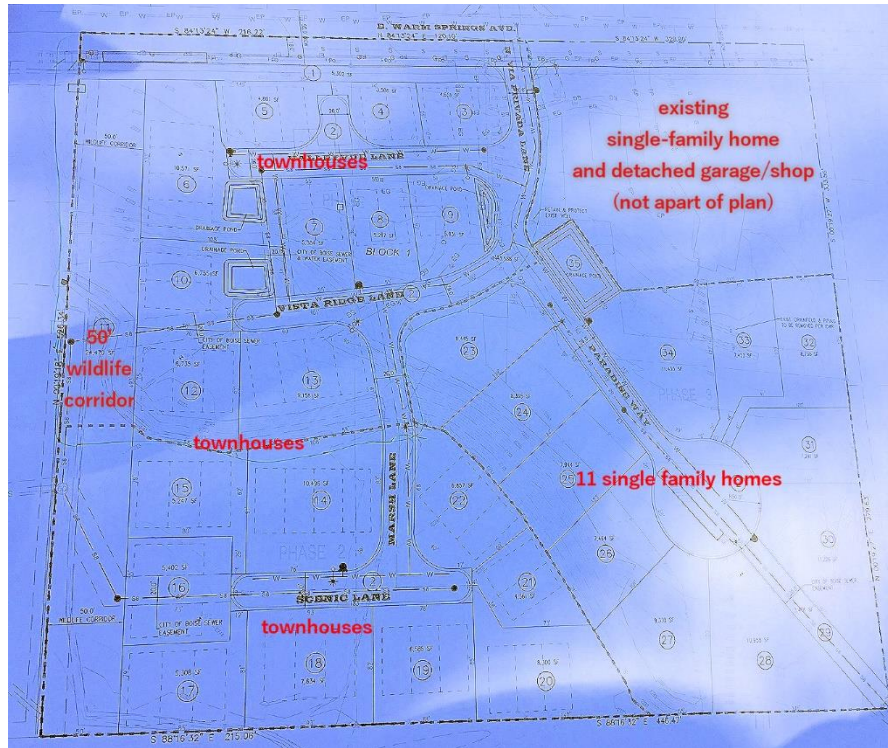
Vista Ridge site plan (single-family homes and townhouses)
